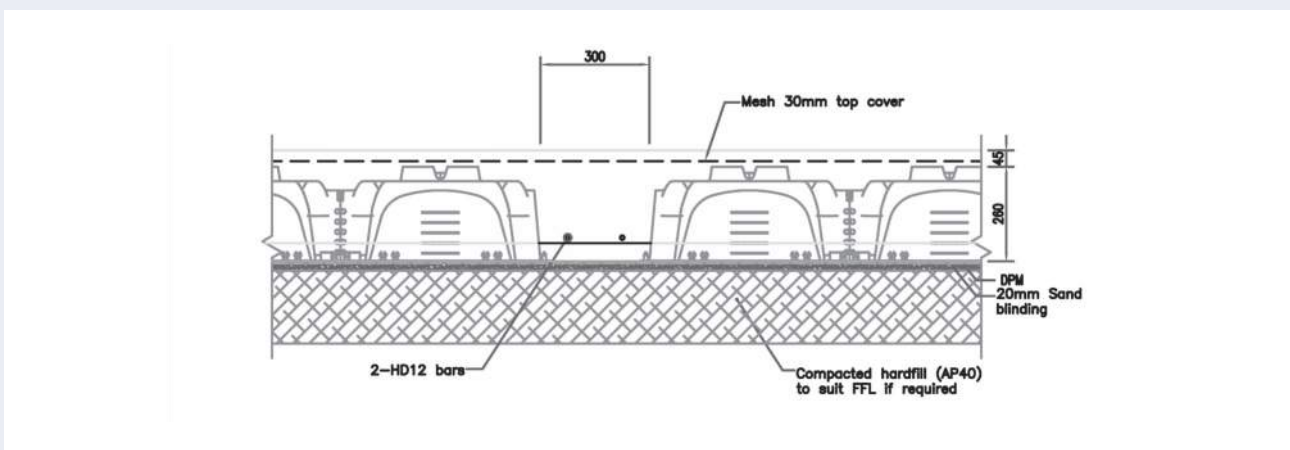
Qpod internal loadbearing wall or slab thickening
